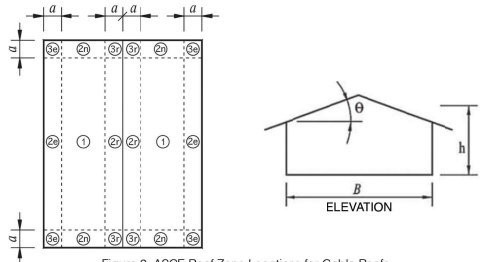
ASCE Roof Zone Locations for Gable Roofs
